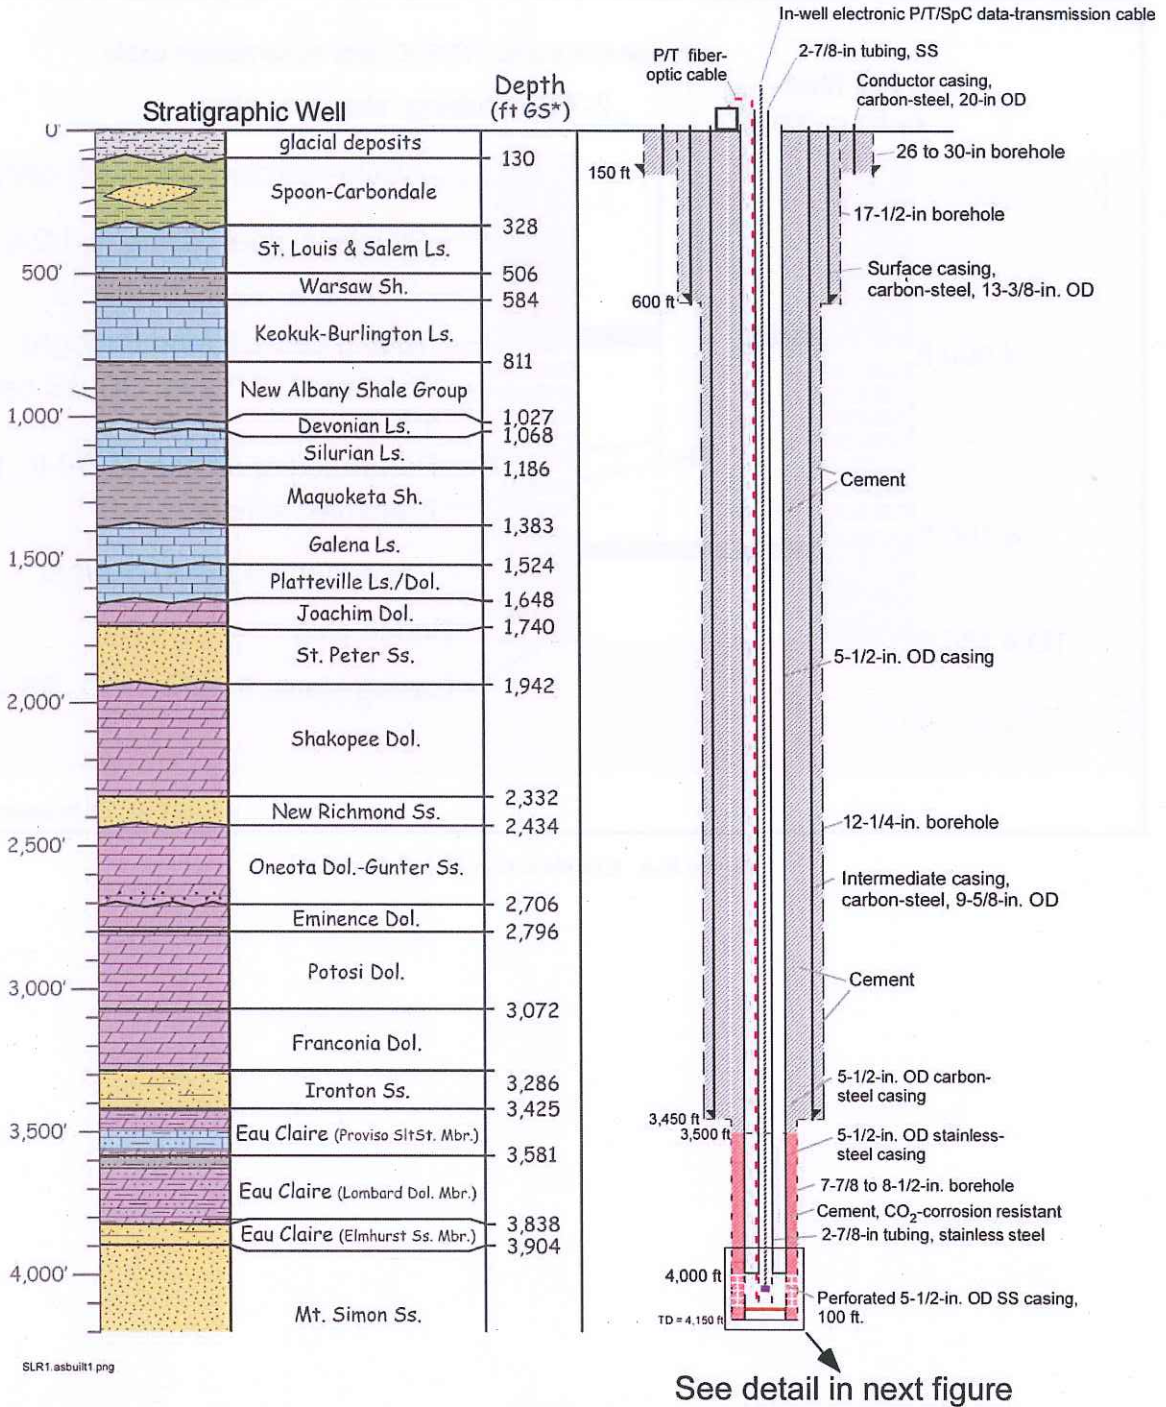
Construction Diagram for the New Single-Level in-Reservoir Monitoring Well (SLR1).
